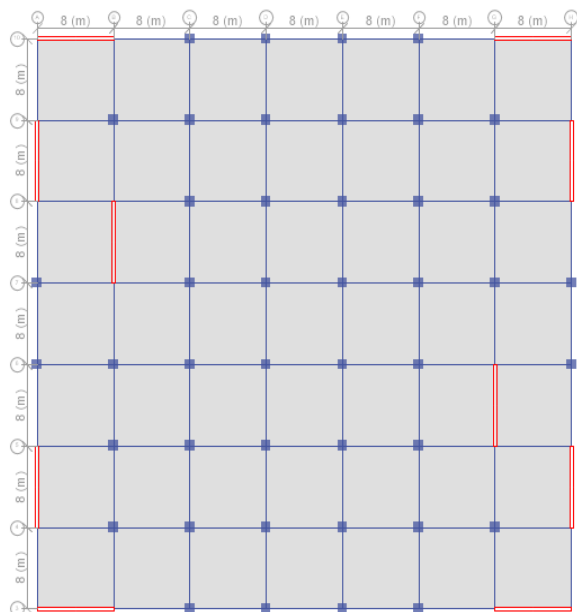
Model 2: Shear Wall with Opening at Centre (3mx1.4m): Plan
